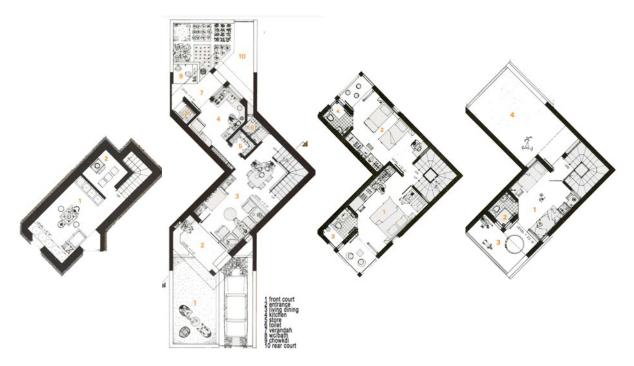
Lower, Ground, First and second floor plans of Cosmoville row houses
